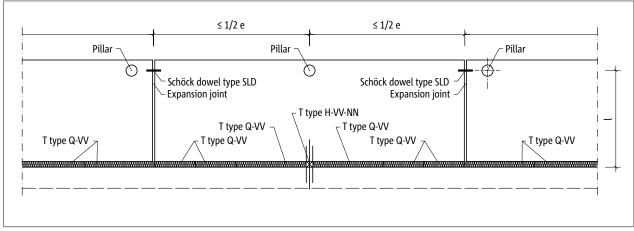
Schöck Isokorb® T type H: Expansion joint layout
